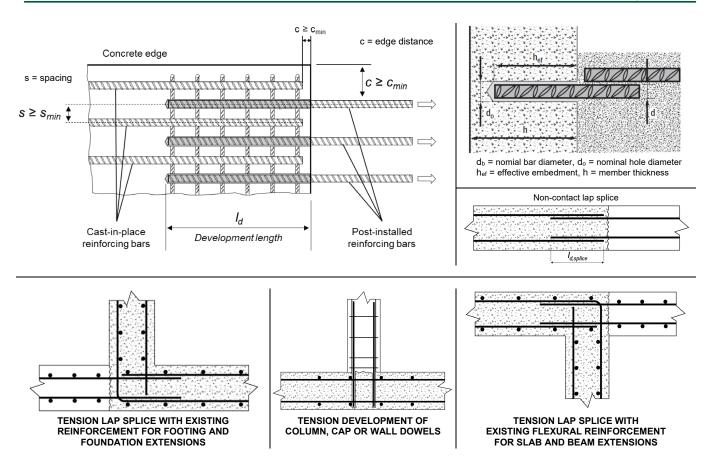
INSTALLATION DETAIL FOR POST-INSTALLED REINFORCING BAR CONNECTIONS (Top Pictures), EXAMPLES OF DEVELOPMENT LENGTH APPLICATION DETAILS FOR POST-INSTALLED REINFORCING BAR CONNECTIONS PROVIDED FOR ILLUSTRATION (Bottom Pictures)
